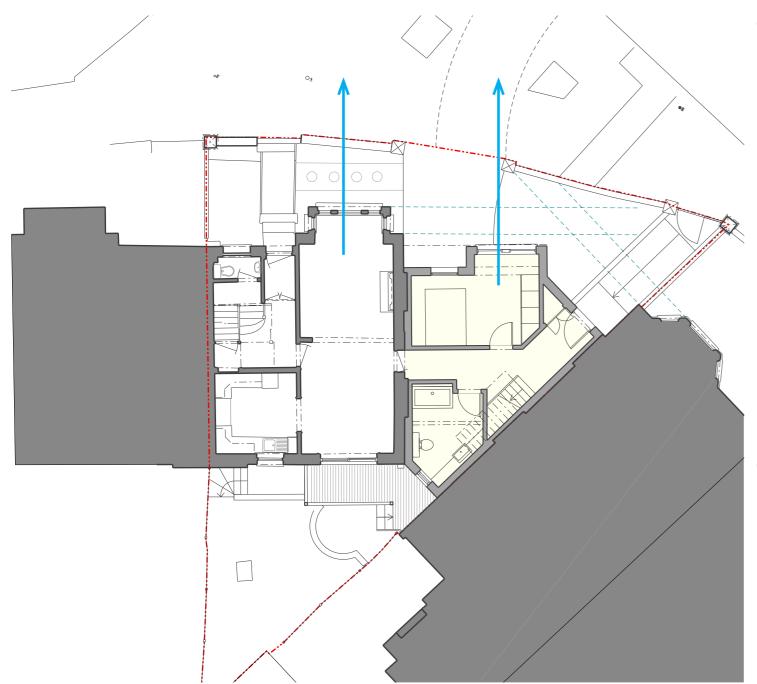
Proposed ground floor plan, Pre-application GIA reduced by 7sqm.
